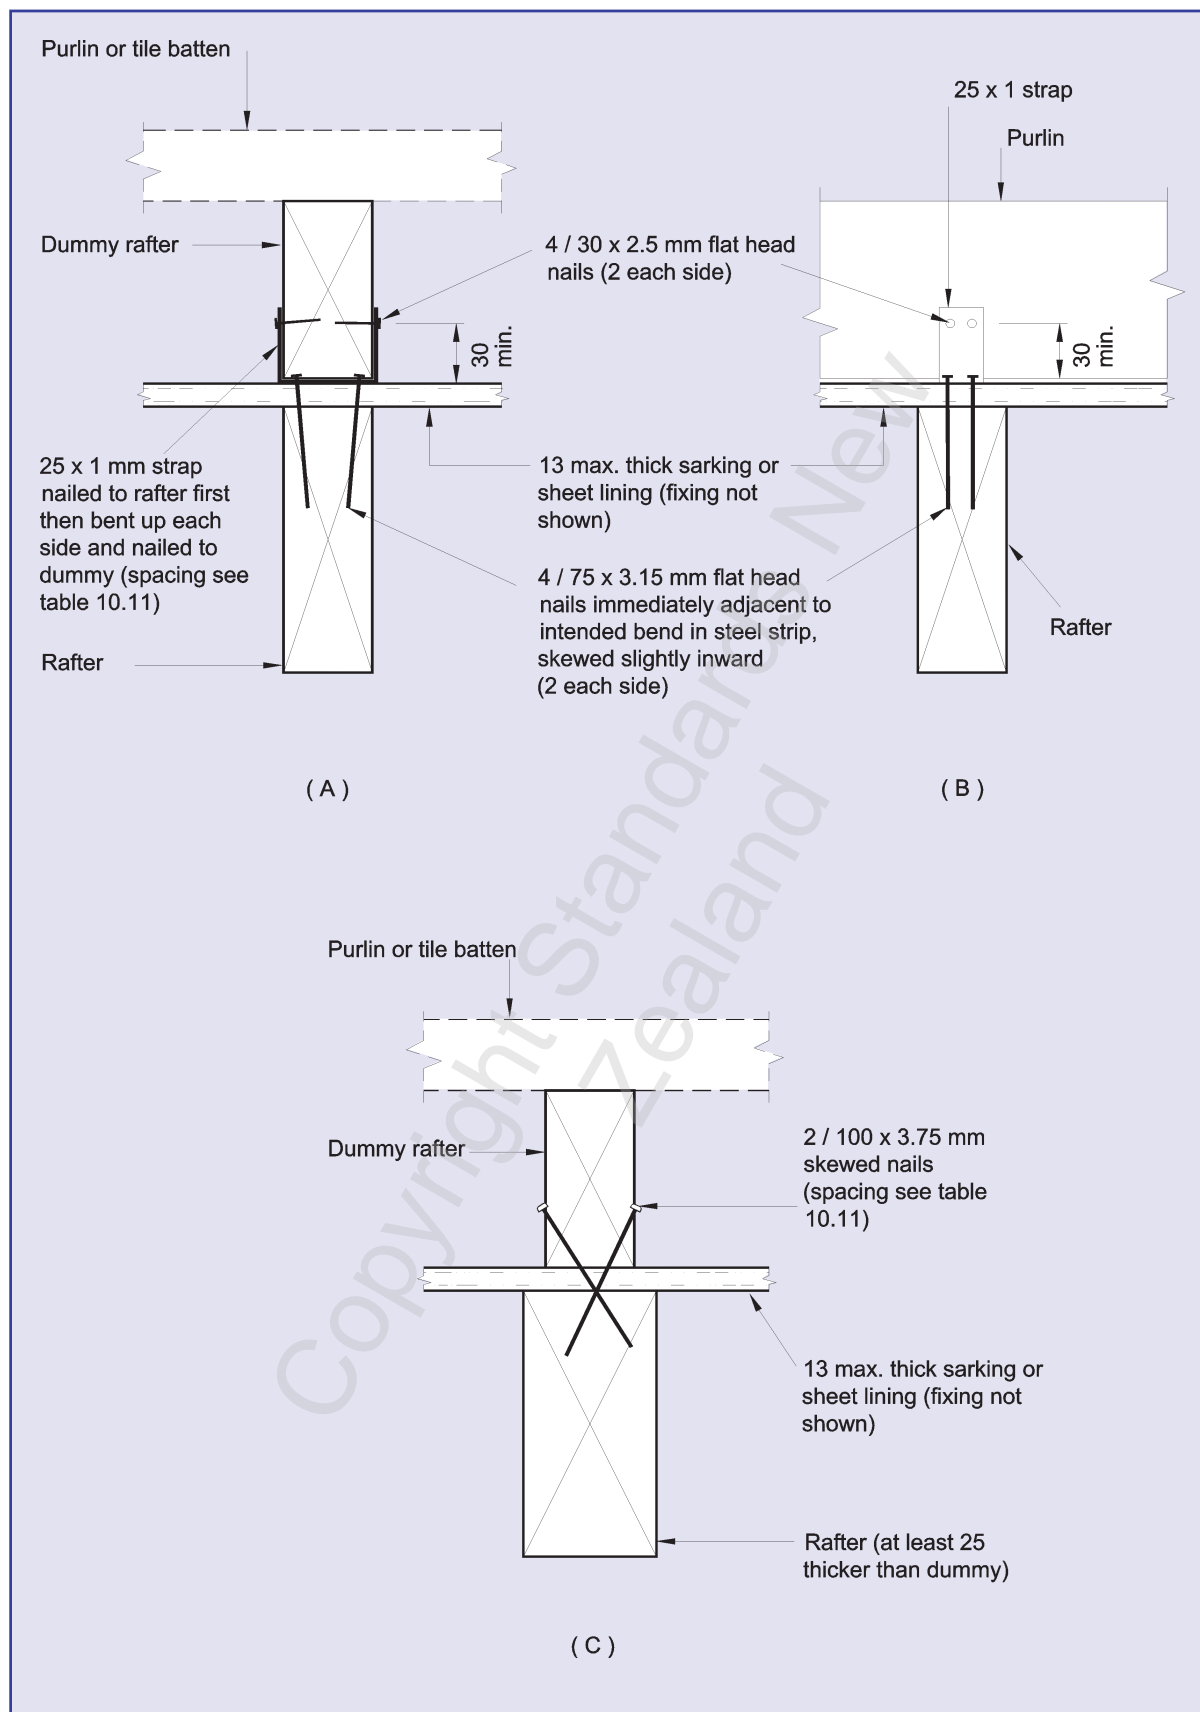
Fixing purlins and dummy rafters to sarked roofs (see 10.2.1.17.1)
